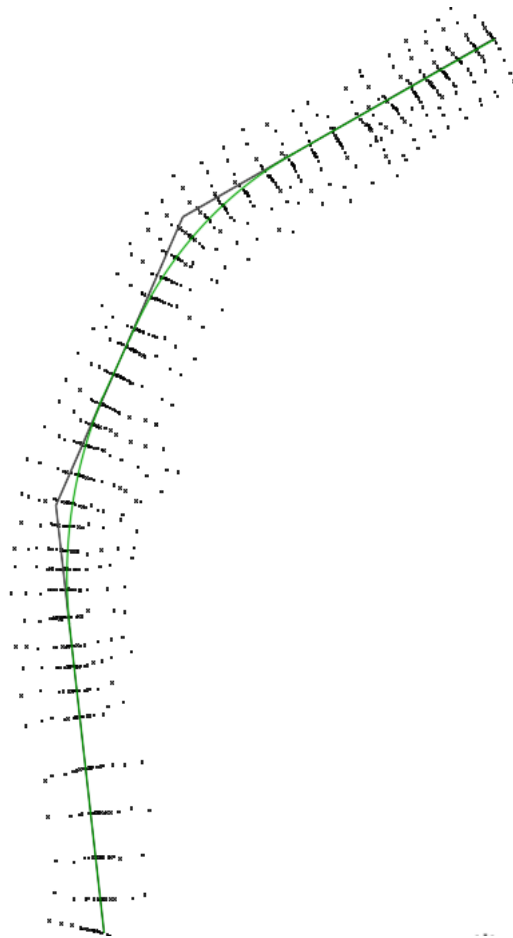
The horizontal alignment of the road section at Chilerawalanda
